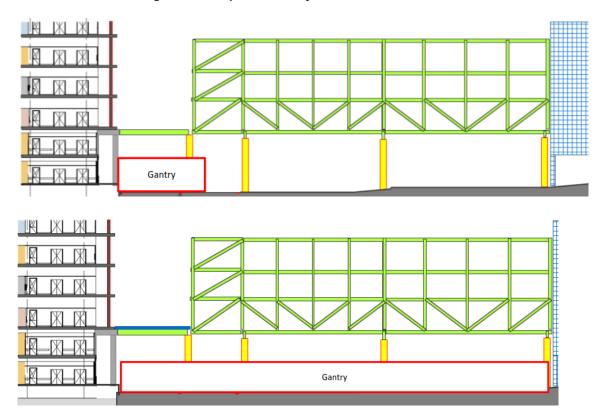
Proposed Gantry Installations - Elevation View (Hospital Road and Delivery Drive)
